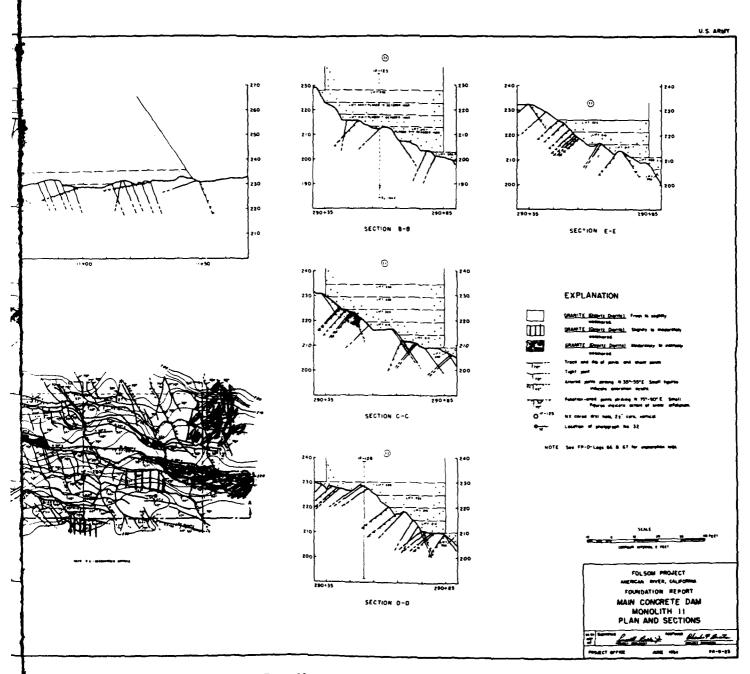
Plan and Sections of Concrete Gravity Dam Mon
